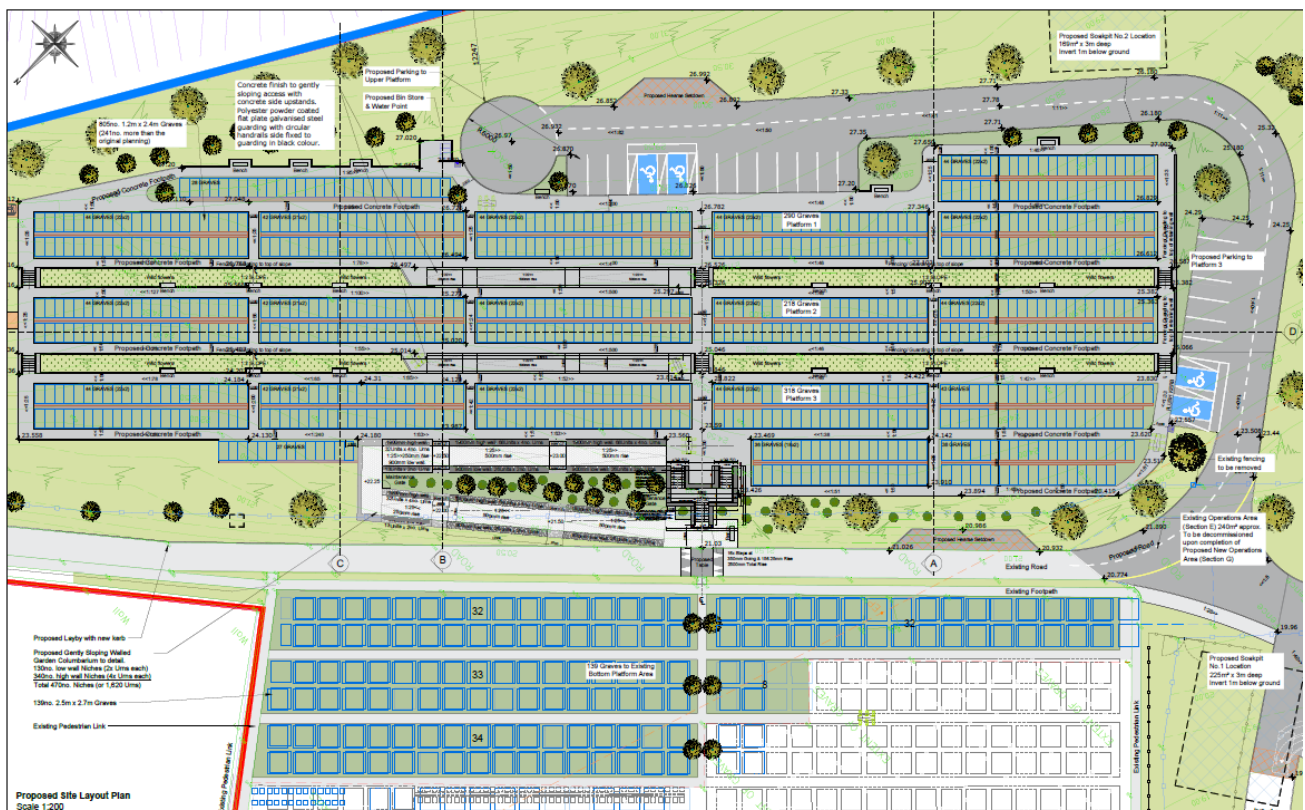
Proposed Site Layout Plan (Source: P.Coleman & Associates)
